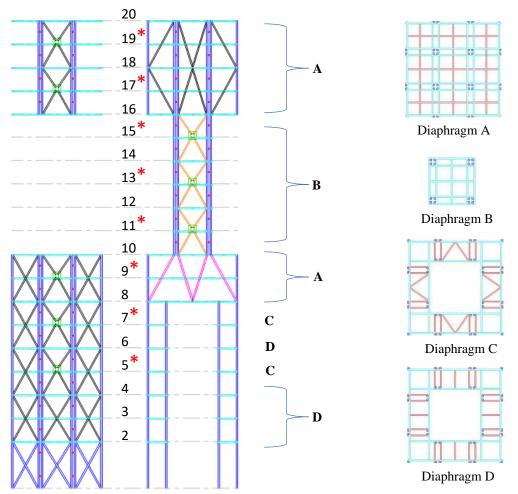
Model A Elevations: (a) Exterior (b) Interior (c) Diaphragm Layout
